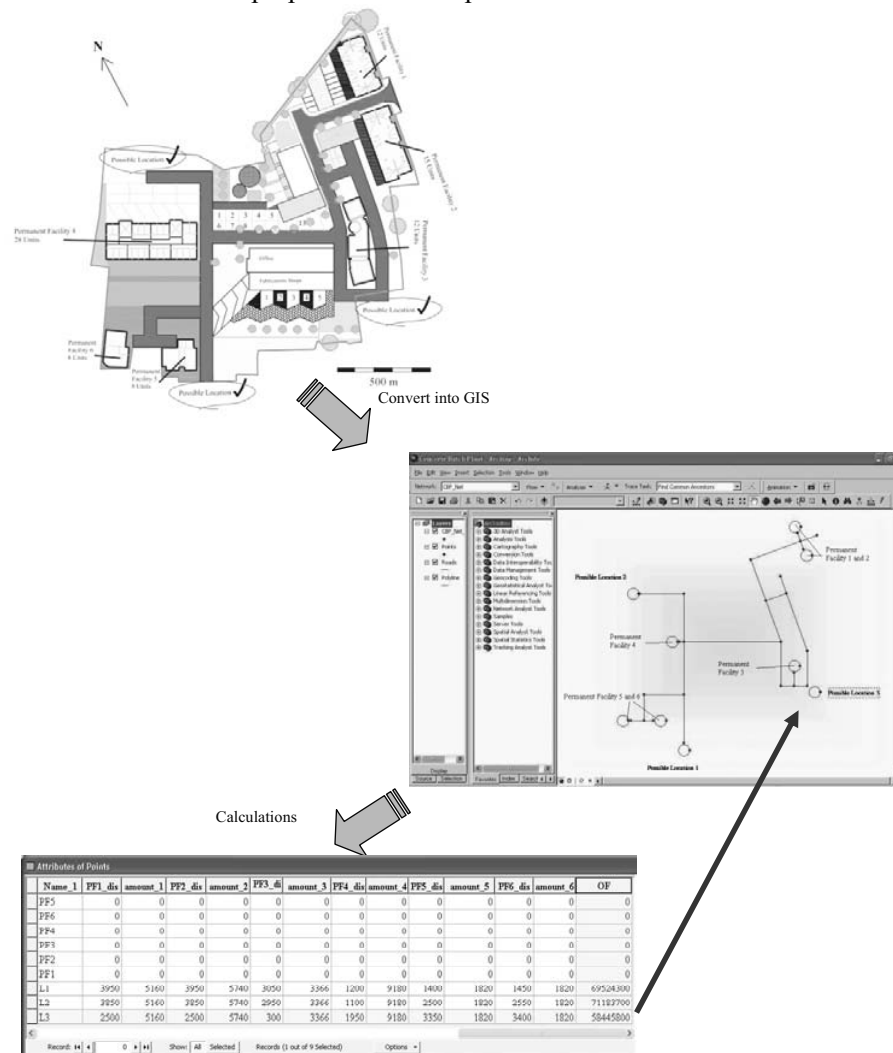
GIS Based Layout of Concrete Batch Plant.
